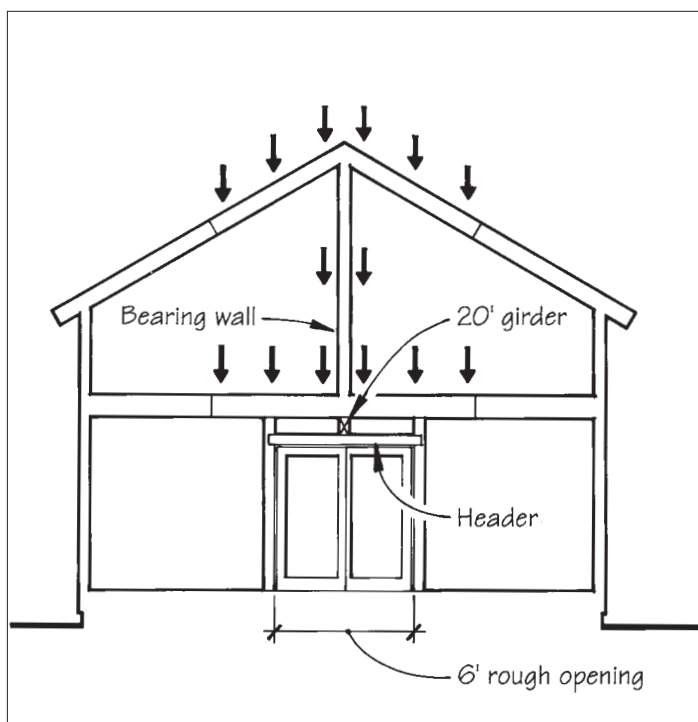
In this example, a 20-foot first-floor support girder also carries a load from the roof. The resulting point load onto the window header is 12,750 pounds.
